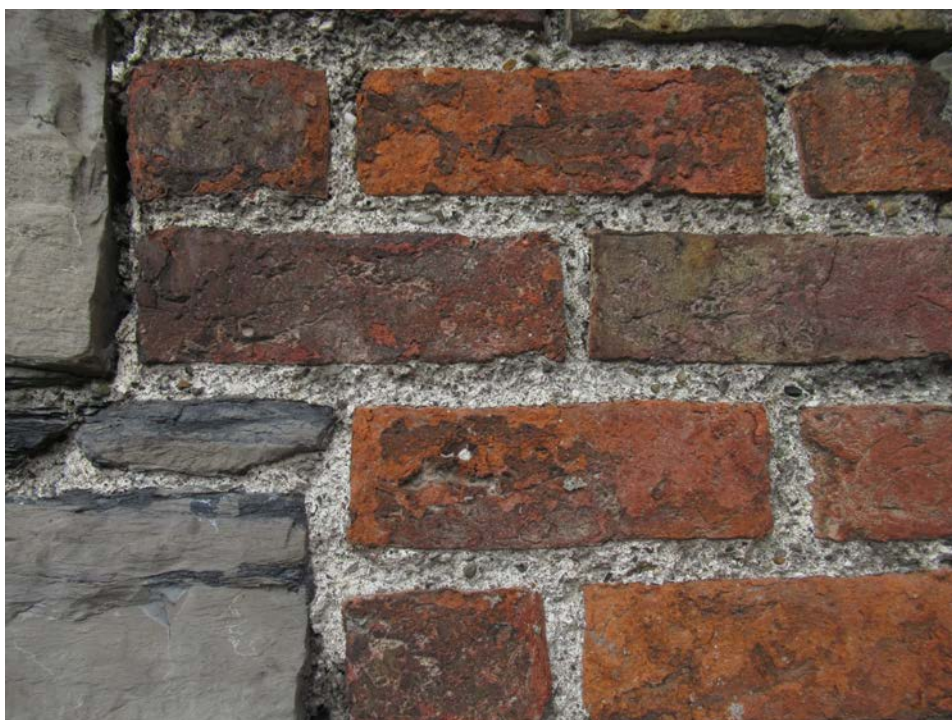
Detail view showing the red brick door jamb seen in the previous photo. This masonry shows the use of ordinary red brick, with coarse lime and sand mortar, used to create a door opening through a rubble stone wall.
